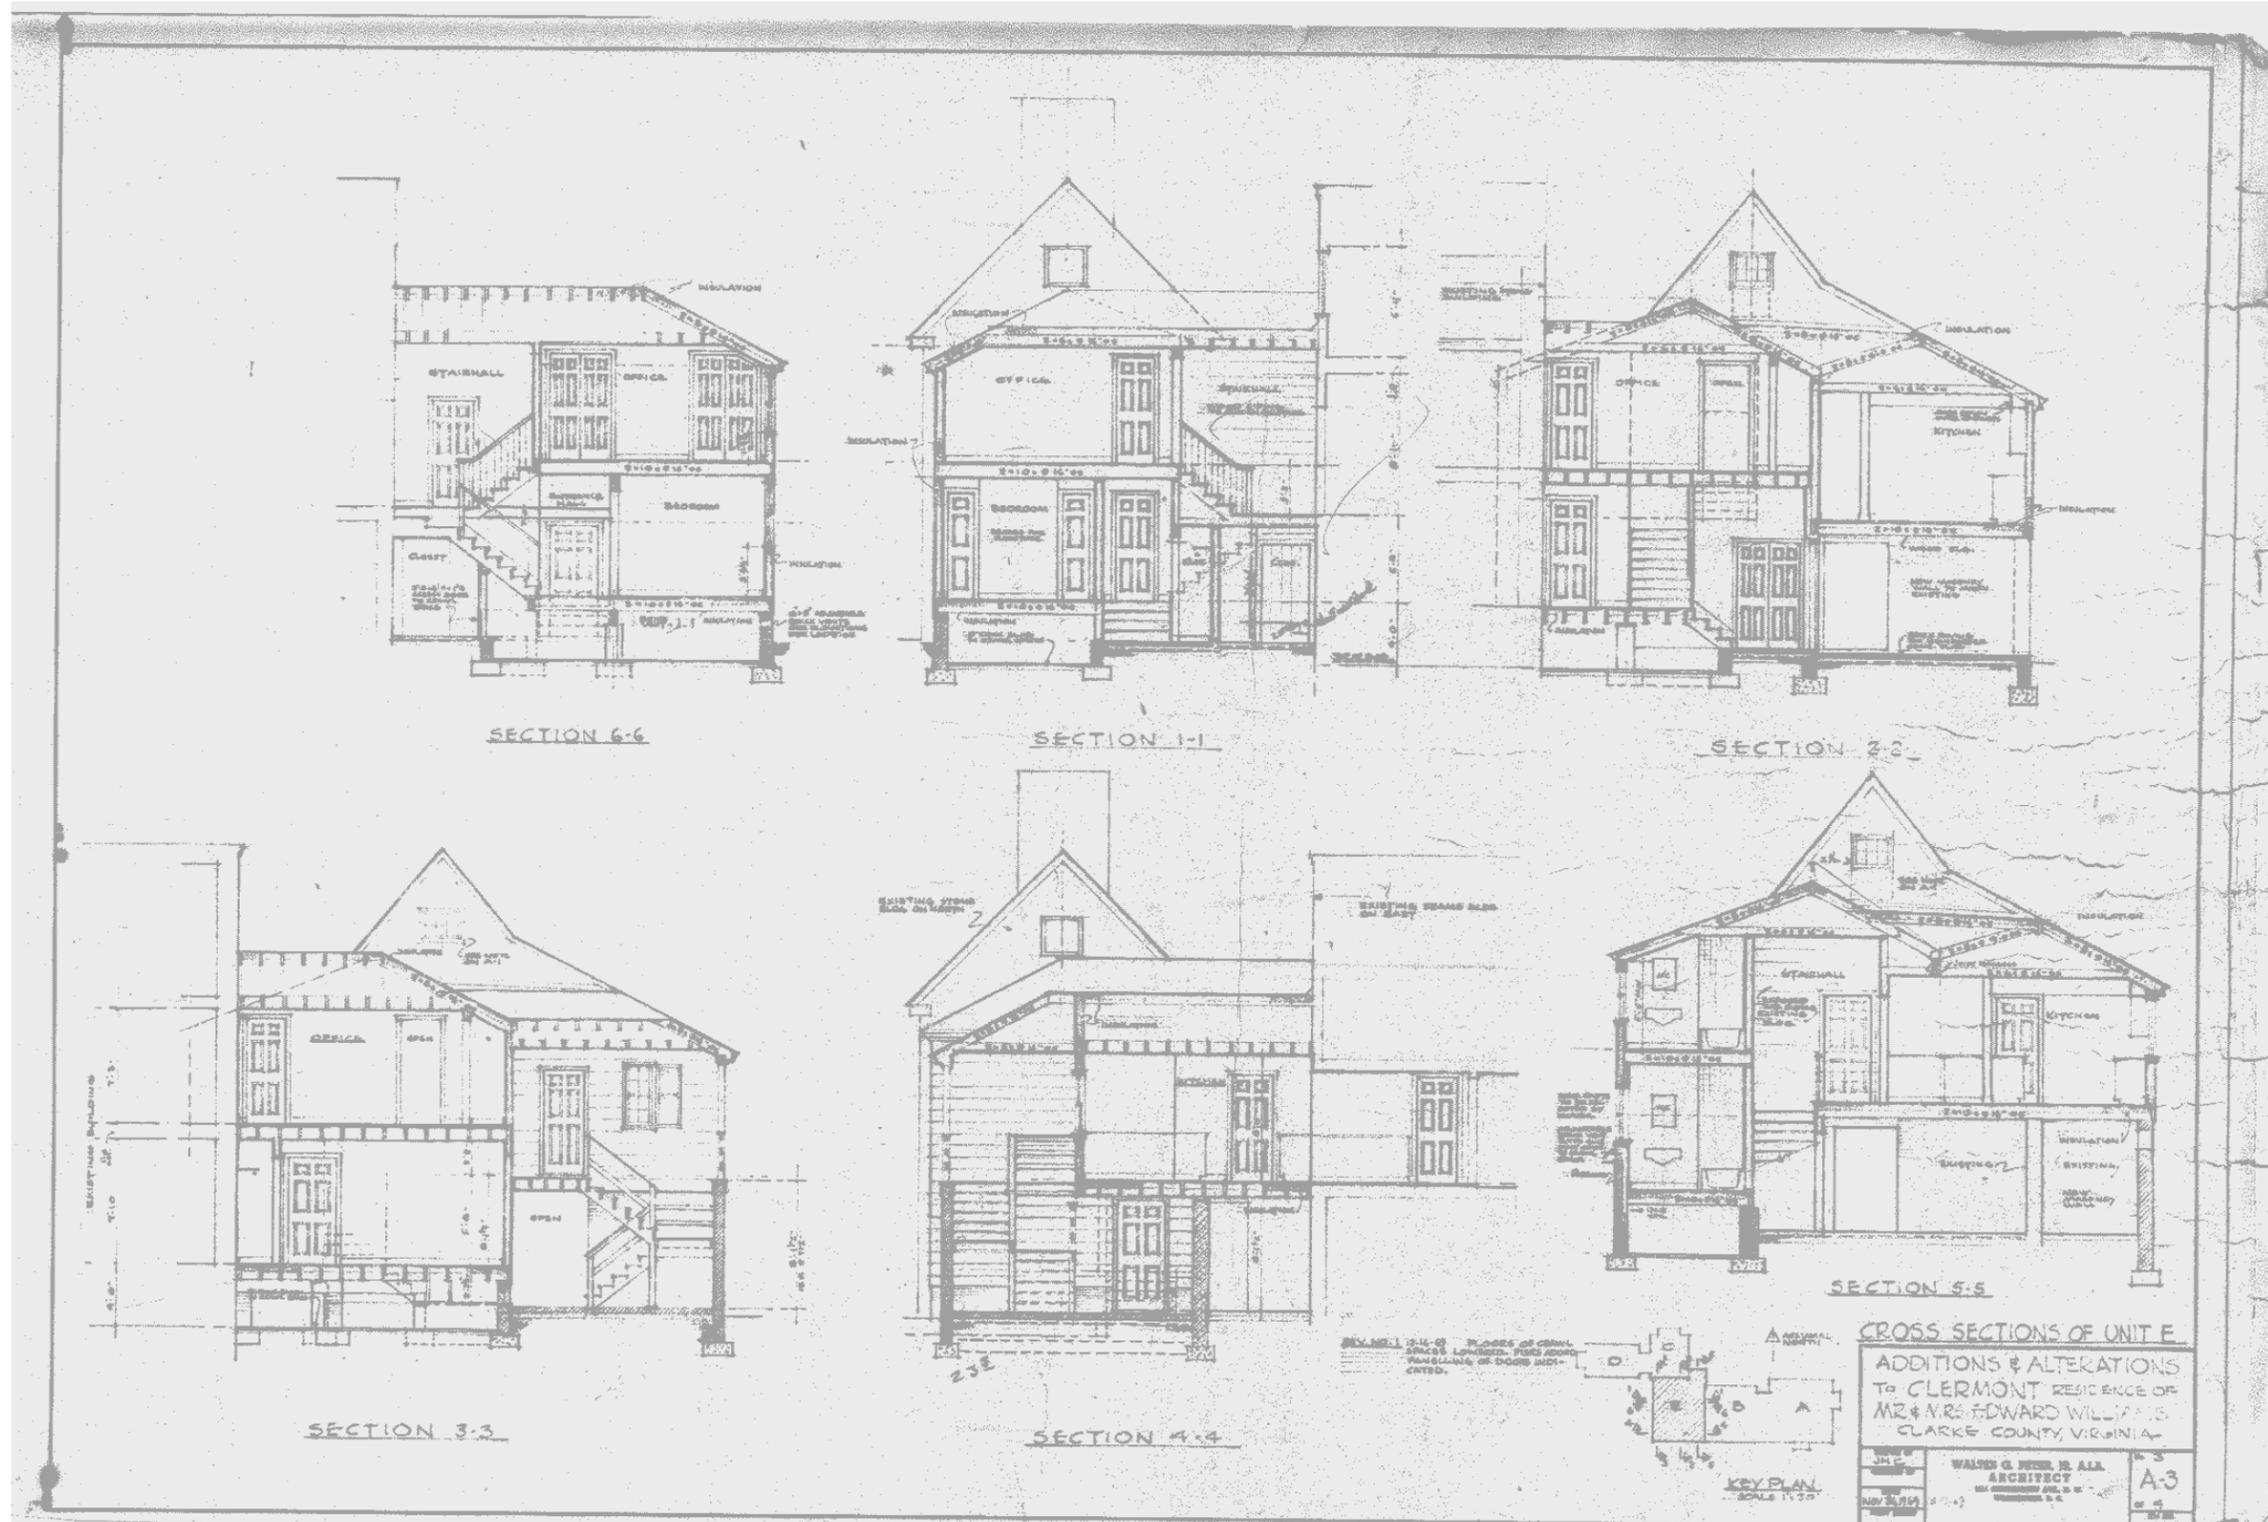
Wall sections of the 1969 additions and alterations construction drawings (not to scale).
